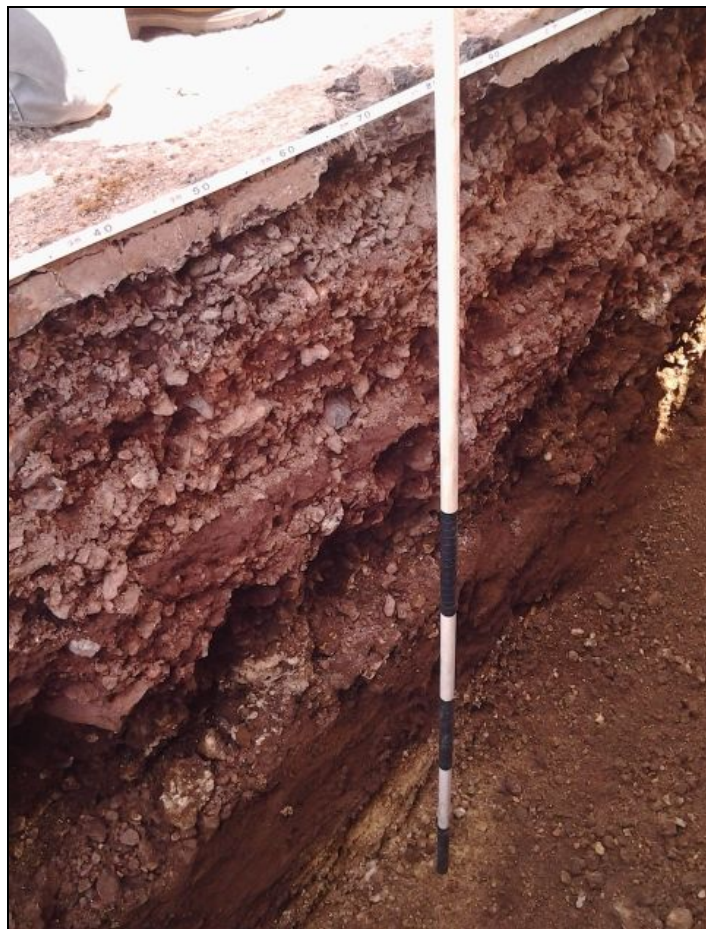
Photograph of Airport Section, T-034, general view of profile, view to northeast
